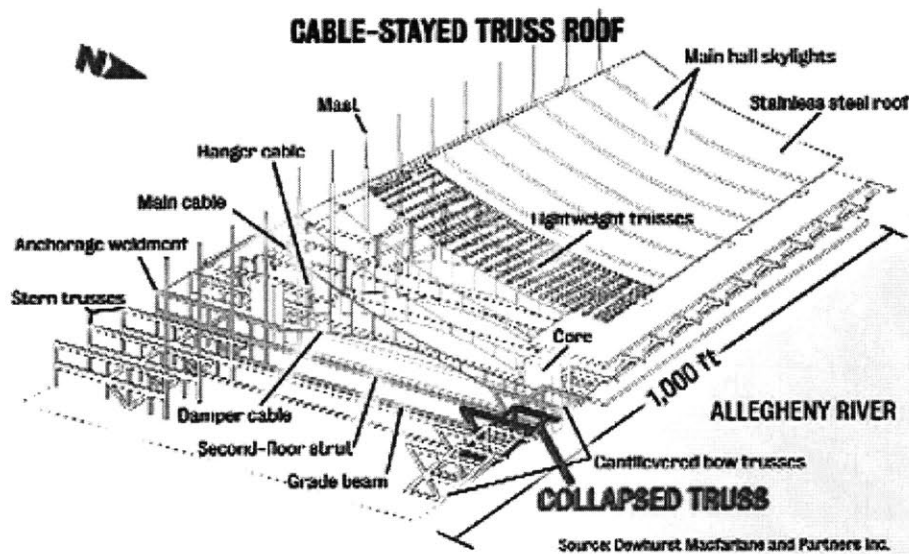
Structural drawing of the exhibition hall showing the key structural elements
